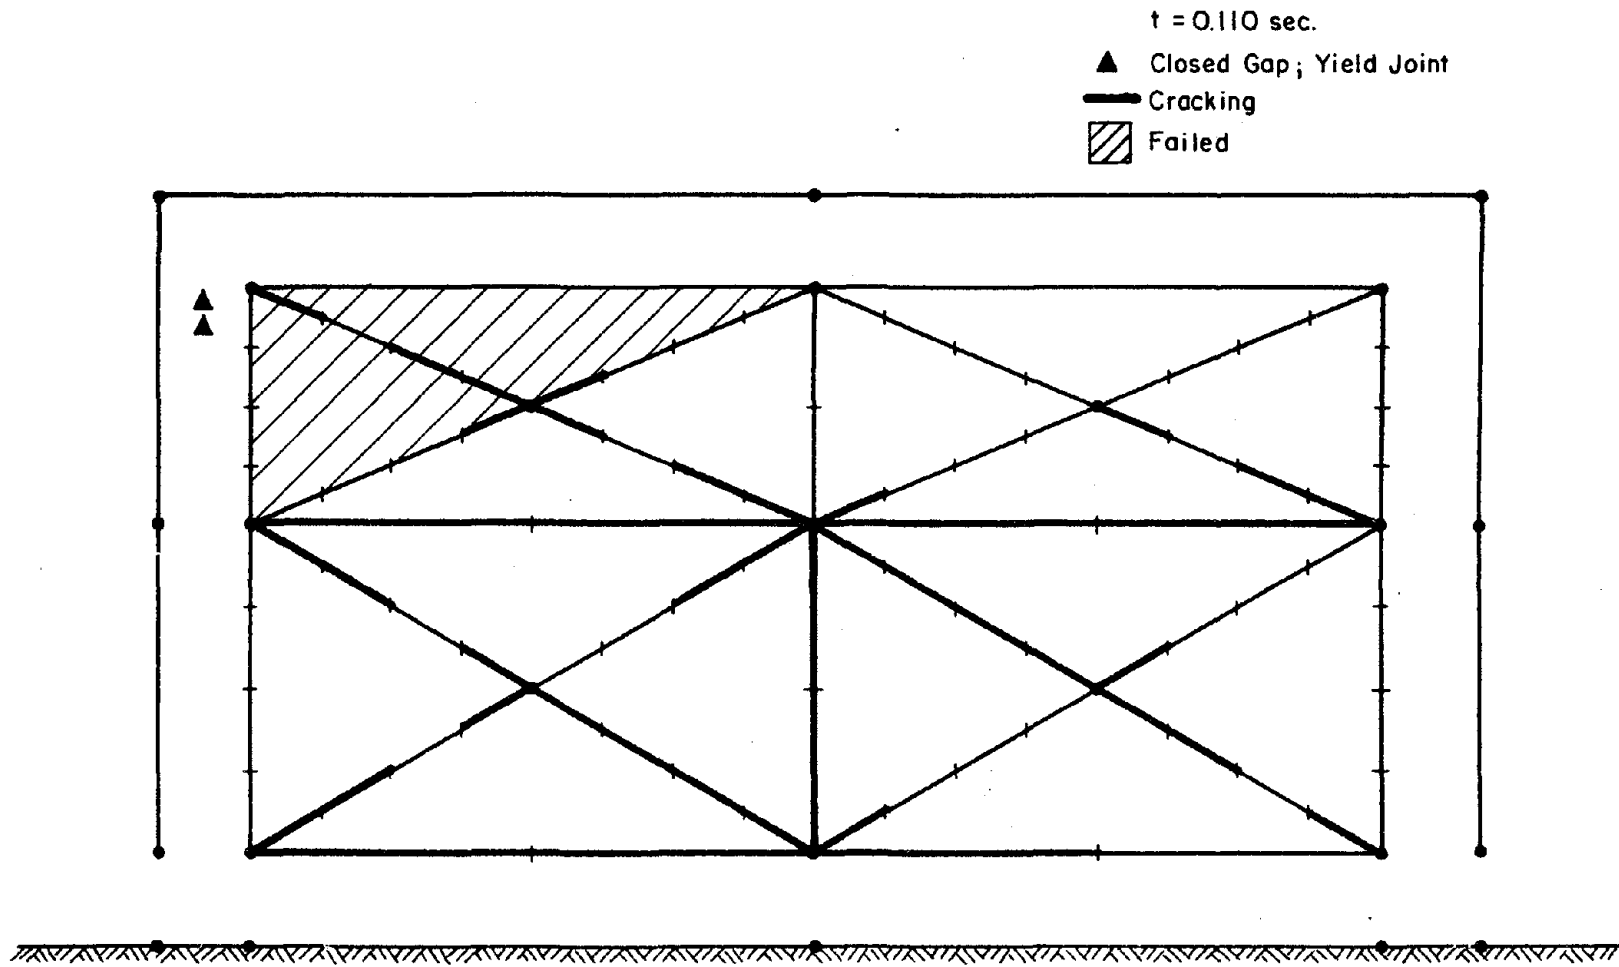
Crack Pattern: Frame Wall-Gaps(I) at t=0.110 sec
